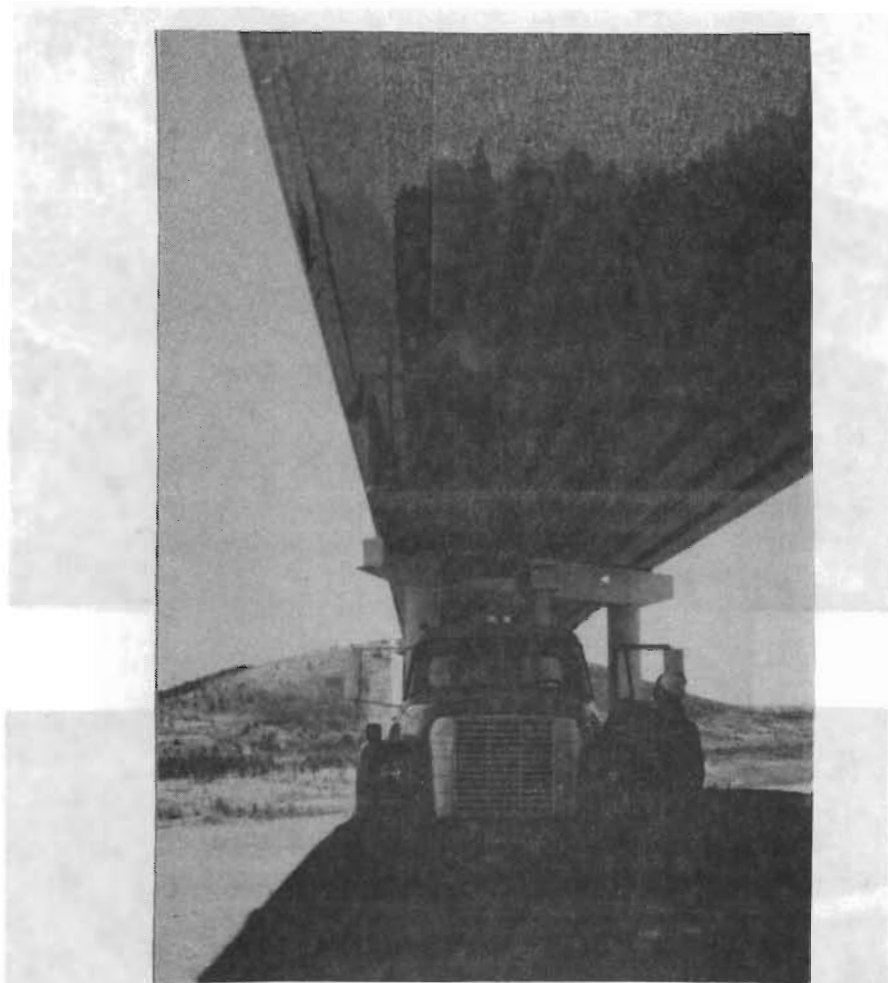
Detailed inspection of girders for any indication of cracking (continued)
